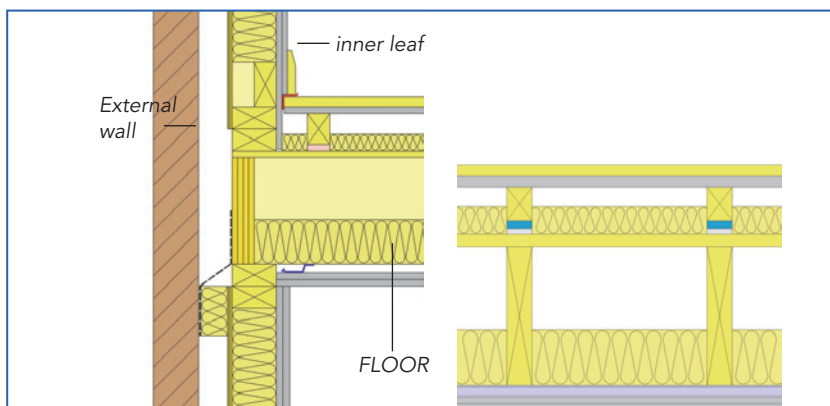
Left: Junction with external wall Right: Section of separating floor [[2] - (U.K)].
